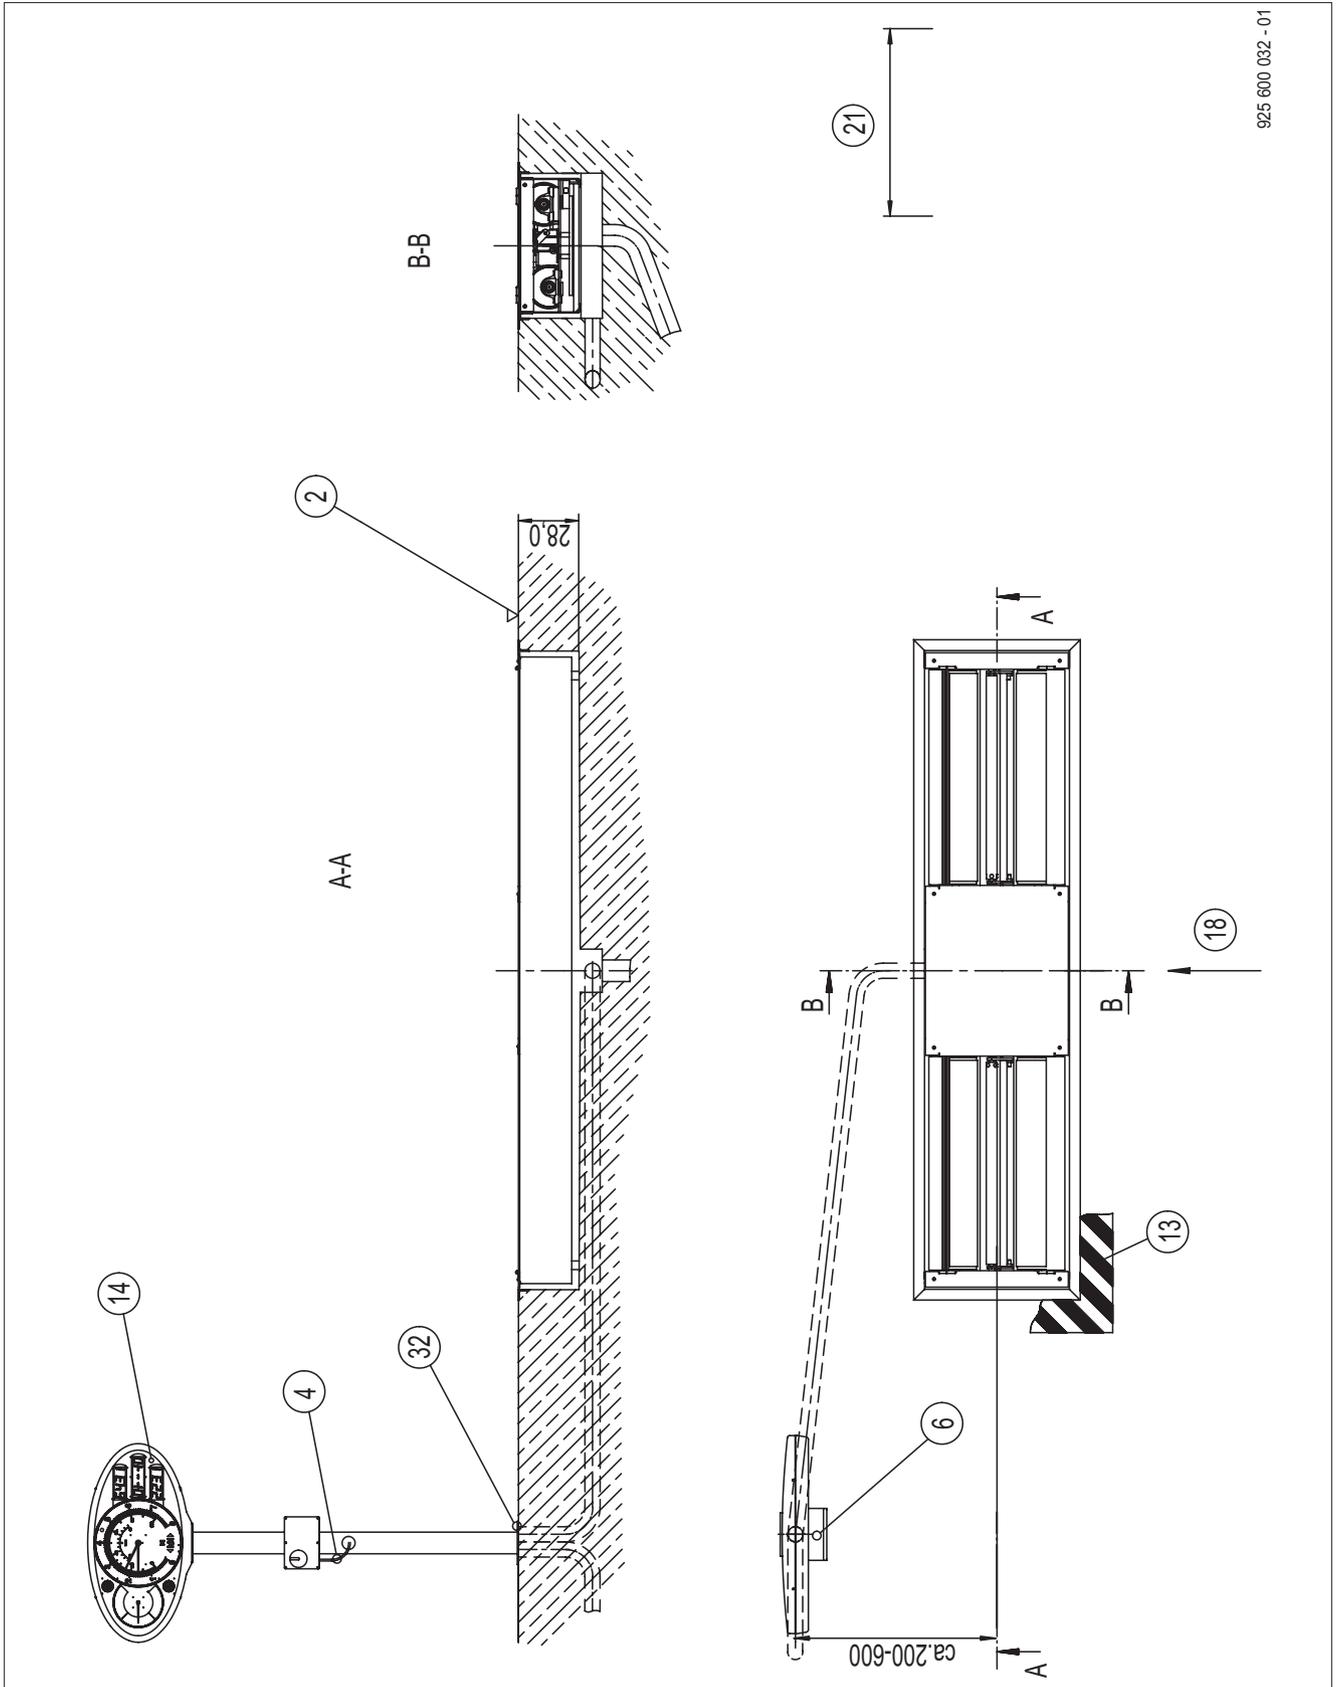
Plan of pit BD 660 with column - Sectional view B-B
